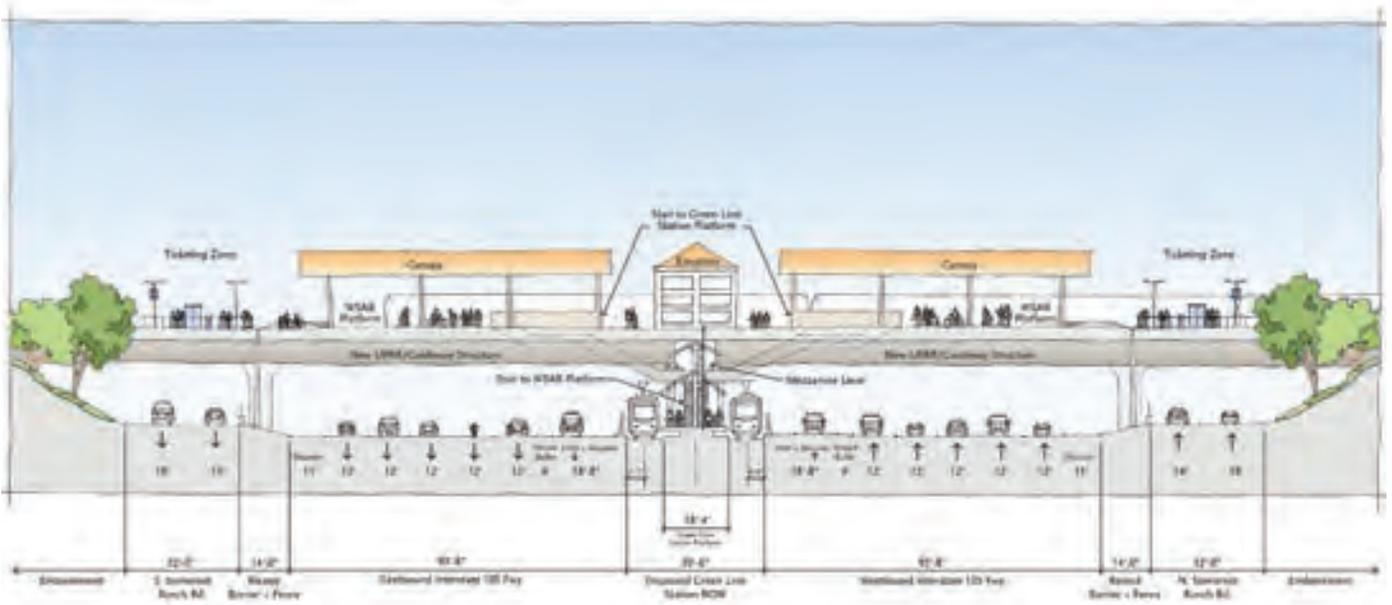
Cross-section through new Metro Green Line Station platform (looking west to new WSAB/Green Line Station above)
